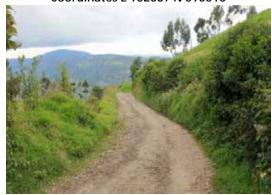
KP0+069. Section of the access road to Ospina Pérez. Point where the Rumichaca - Pasto Divided Highway Project, San Juan - Pedregal segment will cross the road.
